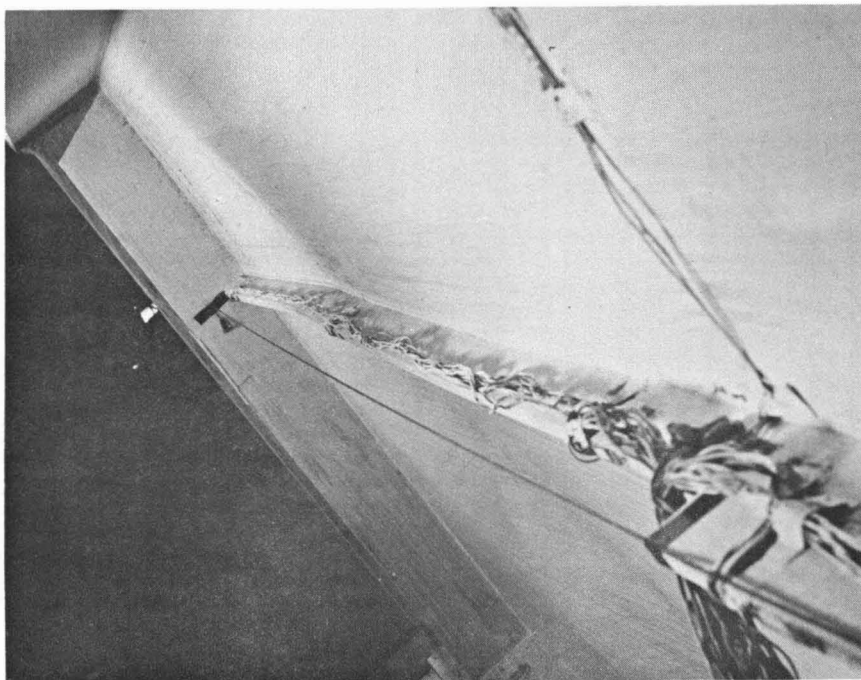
Buckled Longitudinal Stiffener in Girder LS3 After Test T1
